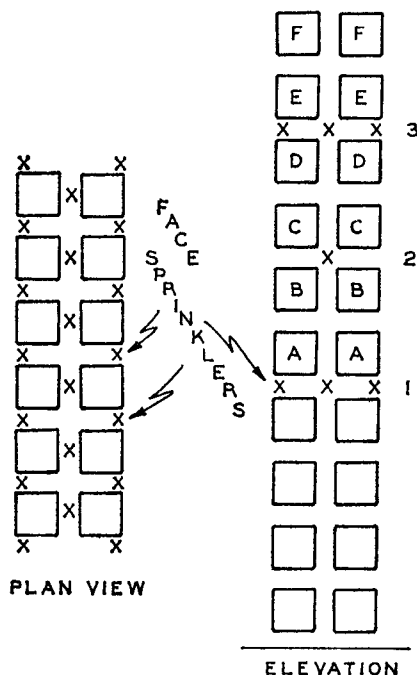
In-Rack Sprinkler Arrangement, Class I, II, III or IV Commodity, Height of Storage over 25 Feet (7.62 m).
